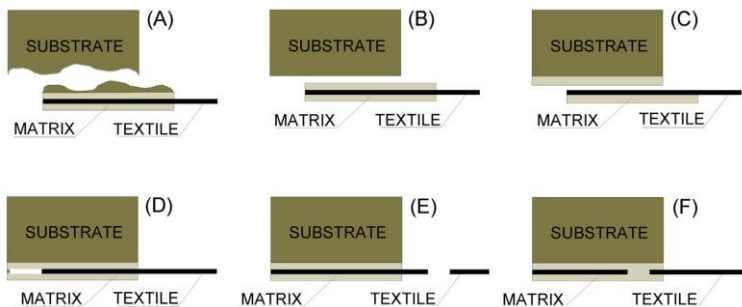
Possible shear bond failure modes of the FRCM systems when applied to the masonry substrate [61]
